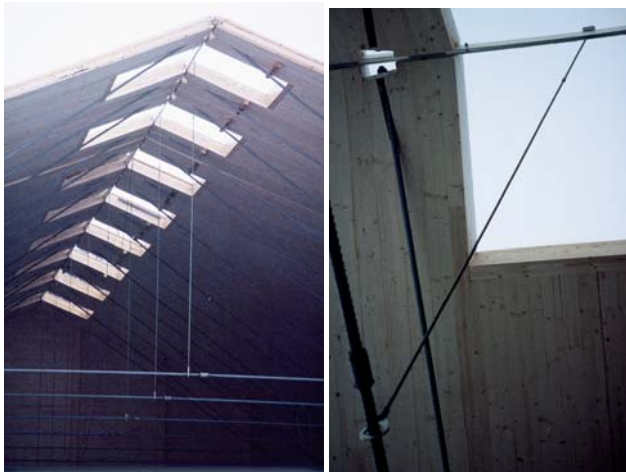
Supporting rod between ridge and the rod connecting the trestles.
